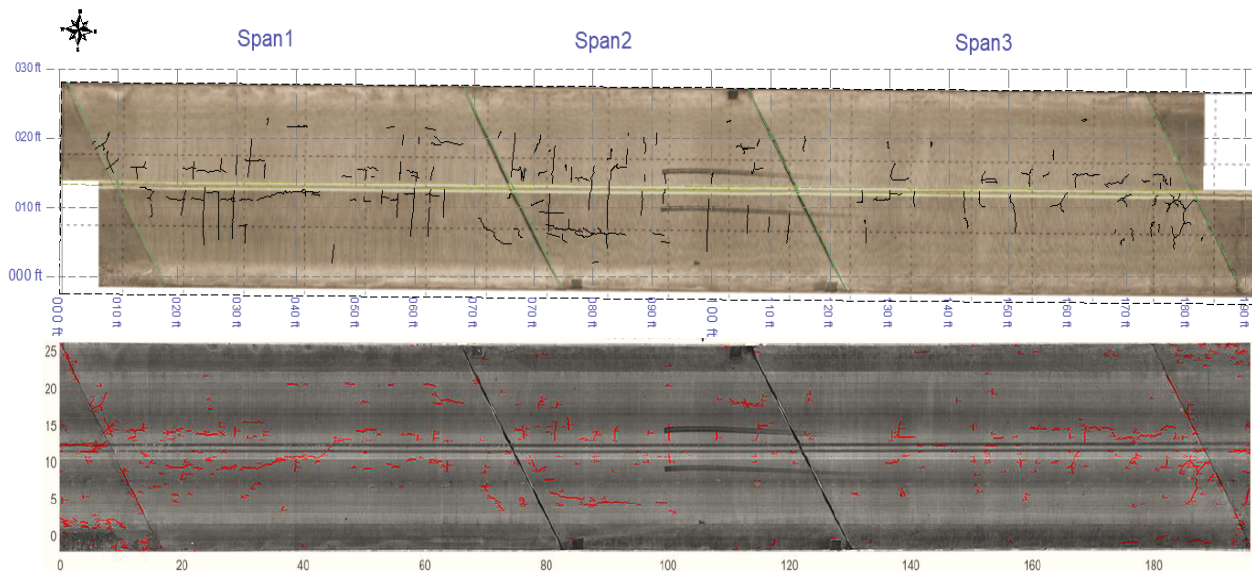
Existing Cracks of Bridge Deck No. 22383-Overall View Image
